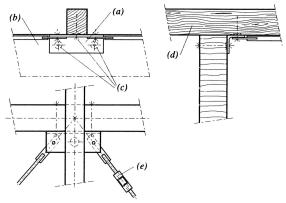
Connection of steel diagonals with wedge formations and flat bars. (a) Steel angle, (b) braced beam, (c) connectors, (d) purlin, (e) turnbuckle.
